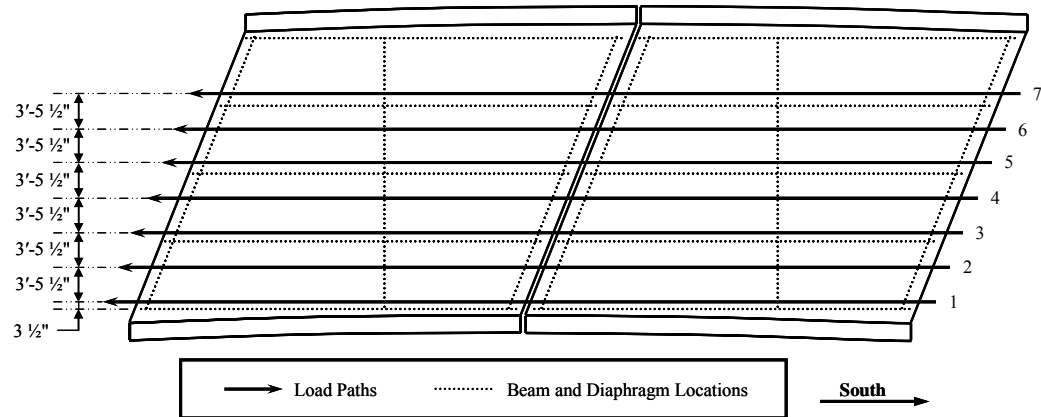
Plan of Loading Paths for Wimberley Load Tests
